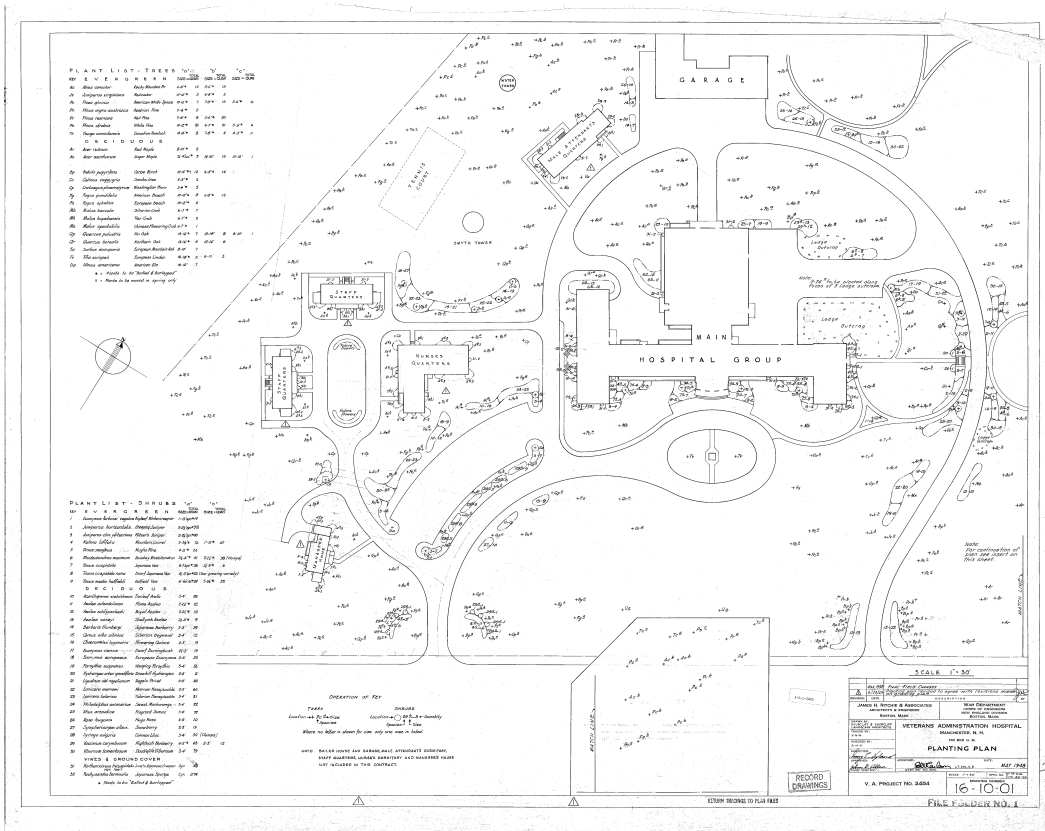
1948 planting plan and site layout of the Manchester Veterans Administration Hospital.
